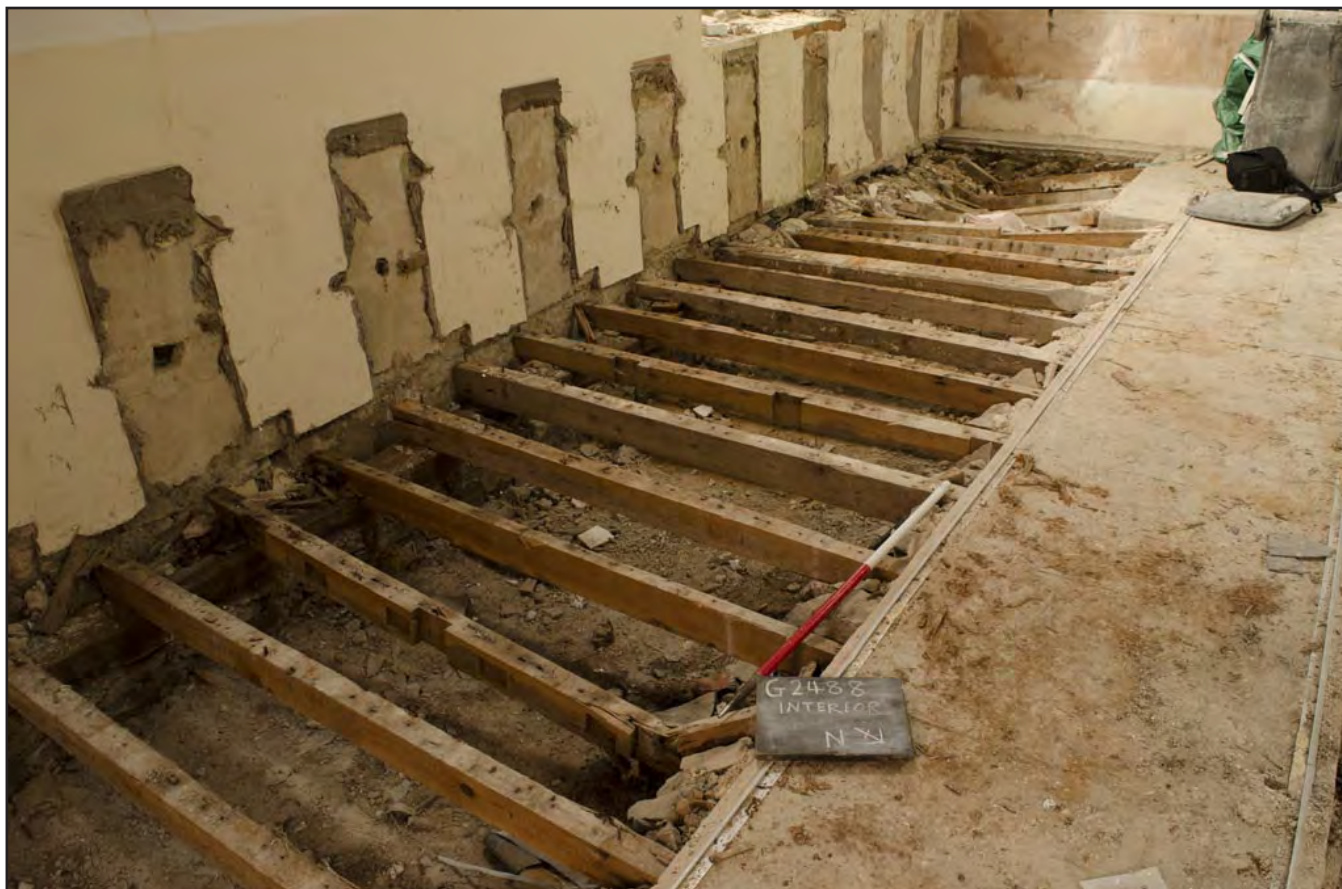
Oblique view of exposed floor joists along southern wall of church; scale: 1x1m (archive reference: G2488_085).
